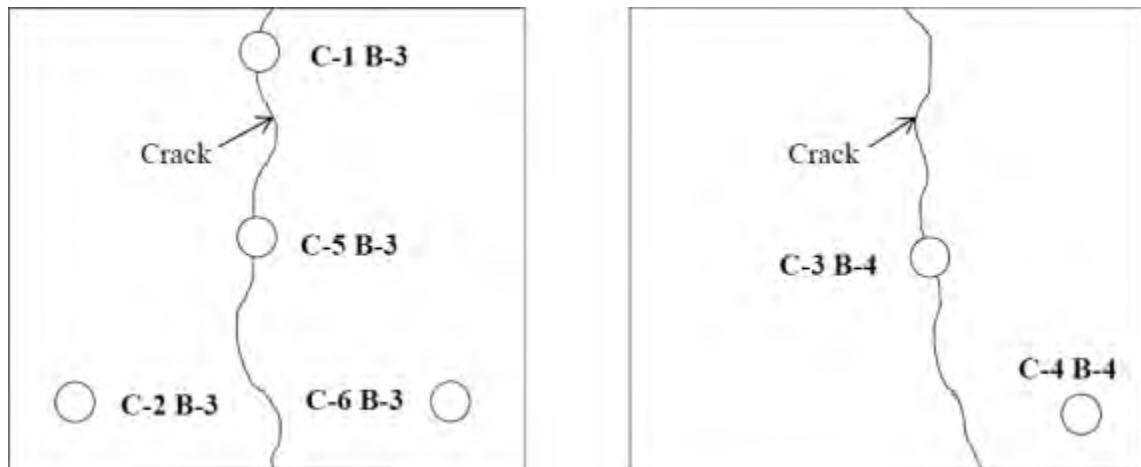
Walker Box Bridge location of extracted cores. (Wang et al. 2018)
